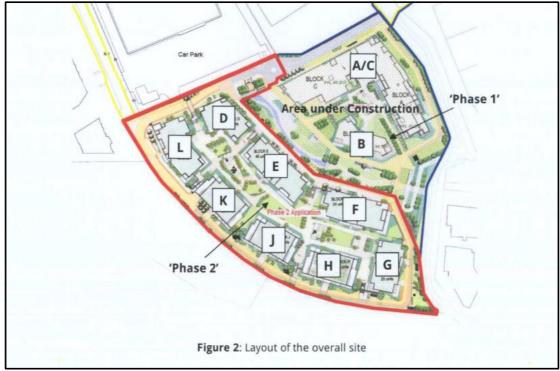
Site Layout (Phase 2) of Residential SHD Application at the Carriglea Site
